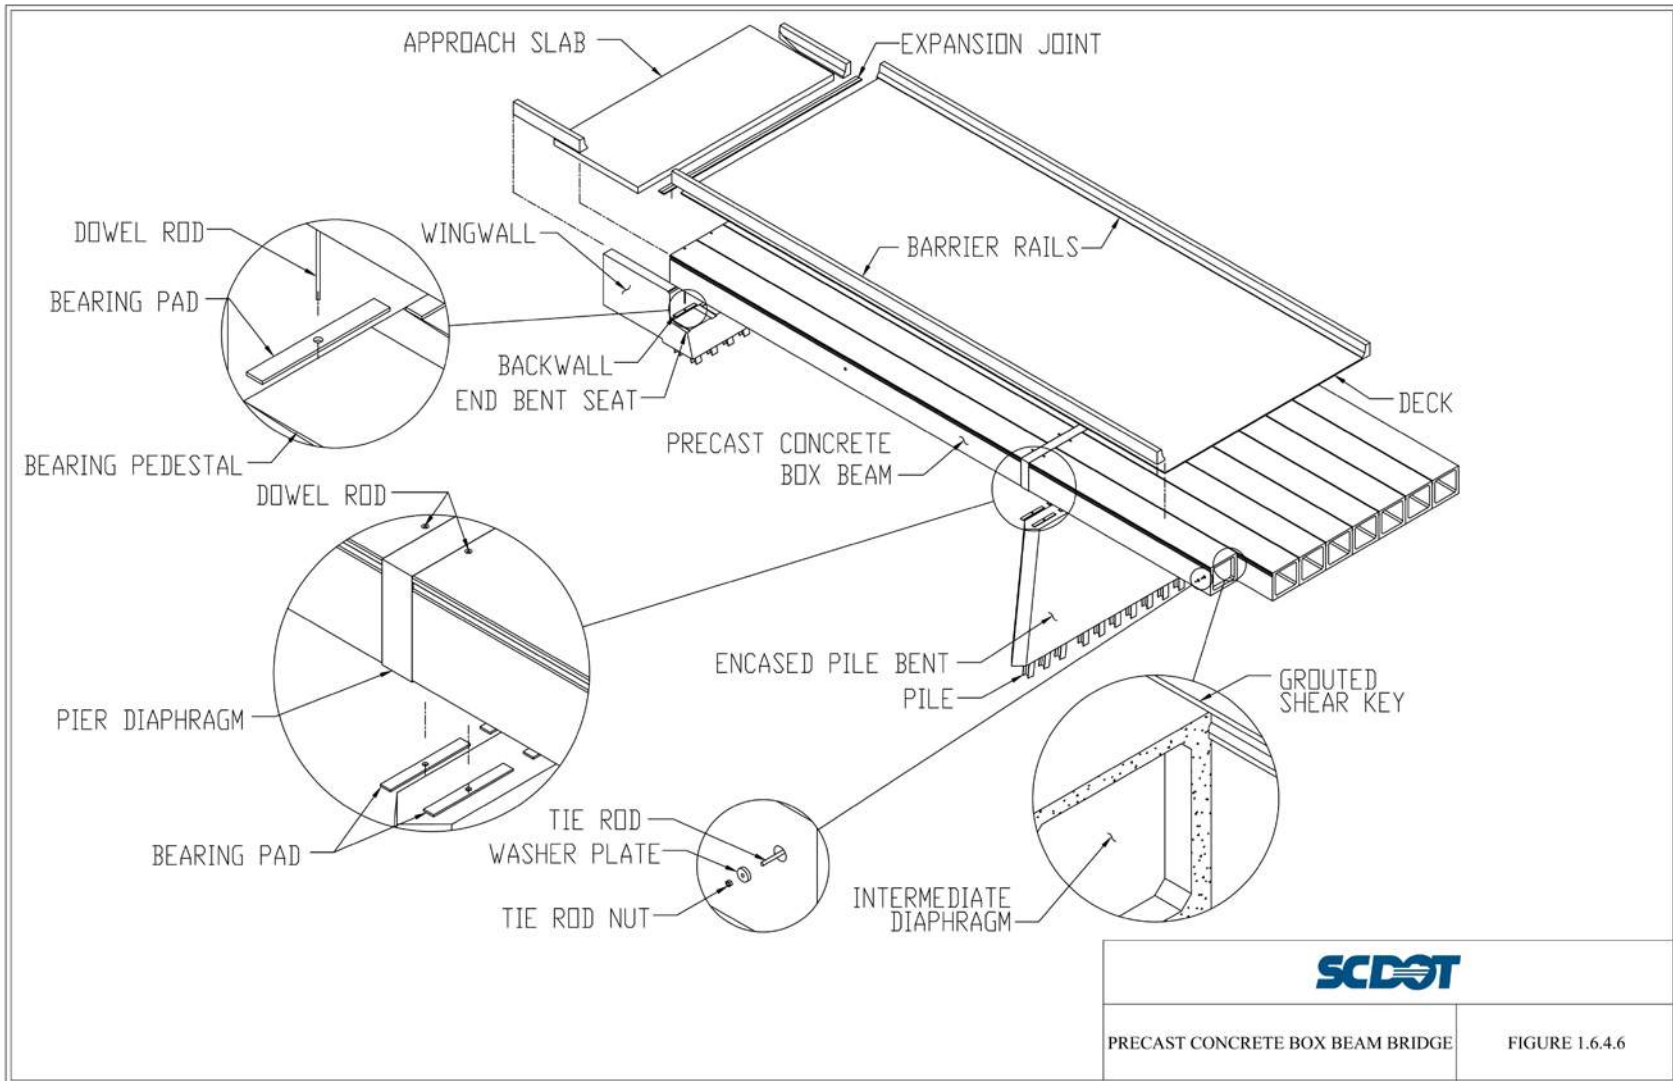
Precast Concrete Box Beam Bridge Components
